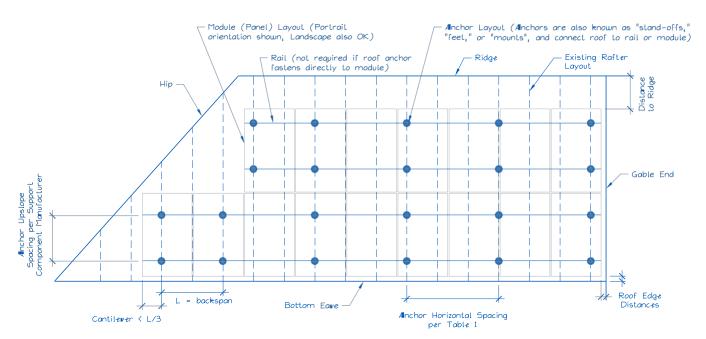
Sample Solar Panel Array and Anchor Layout Diagram (Roof Plan).
